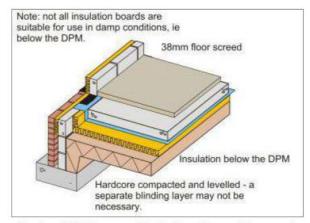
Diagram of typical modern solid concrete ground floor - subject property may not be to this
